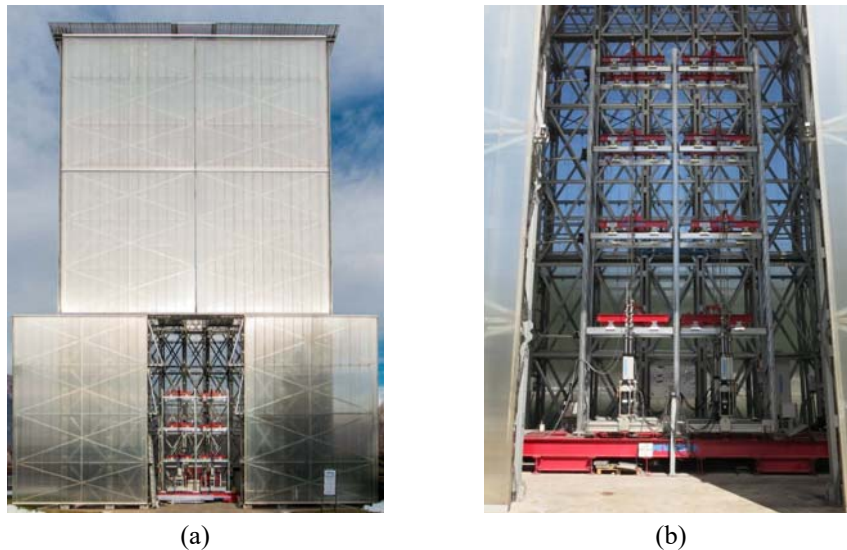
The testing tower: external view (a) and a rack under test (b).
